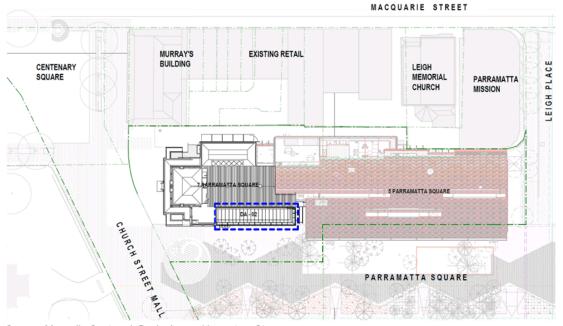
Town Hall Building - Southern Annexe - outlined blue
